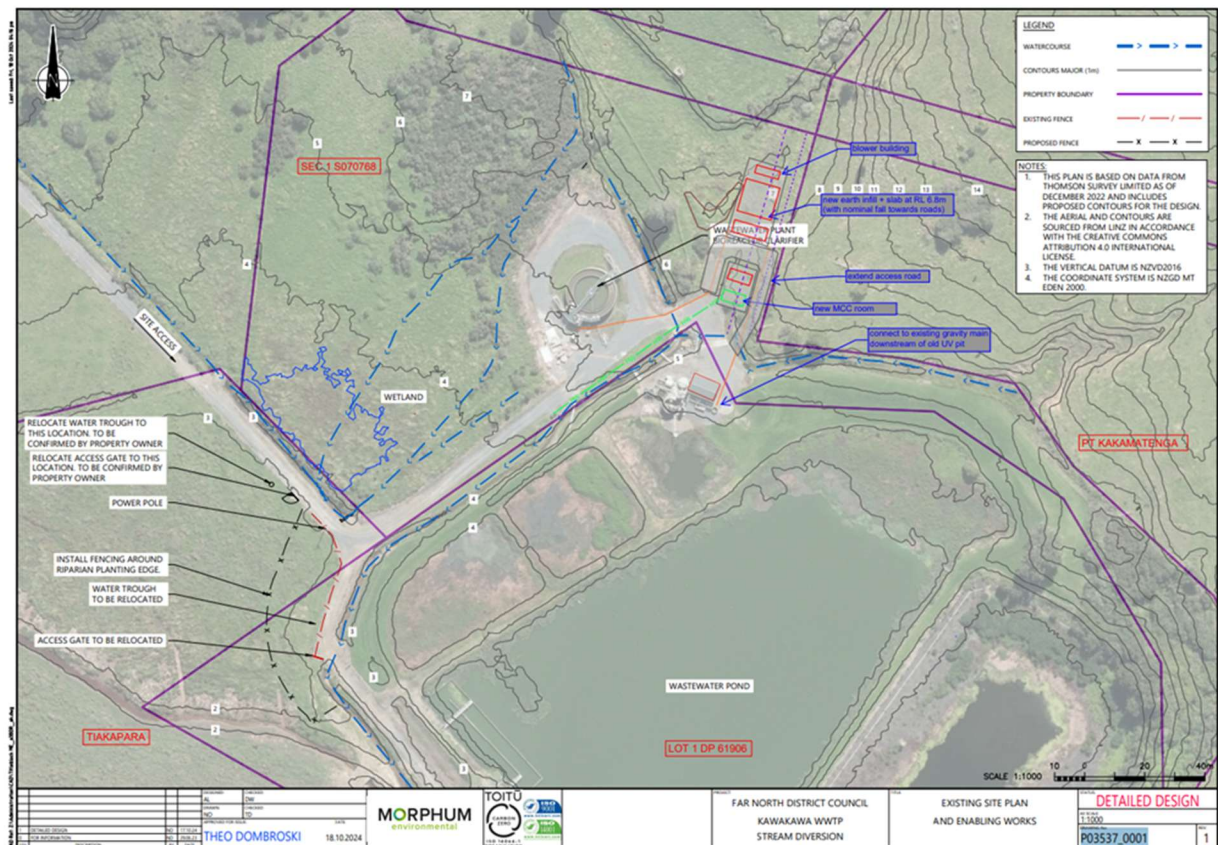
Site plan showing location of earthworks - also refer Appendix C
